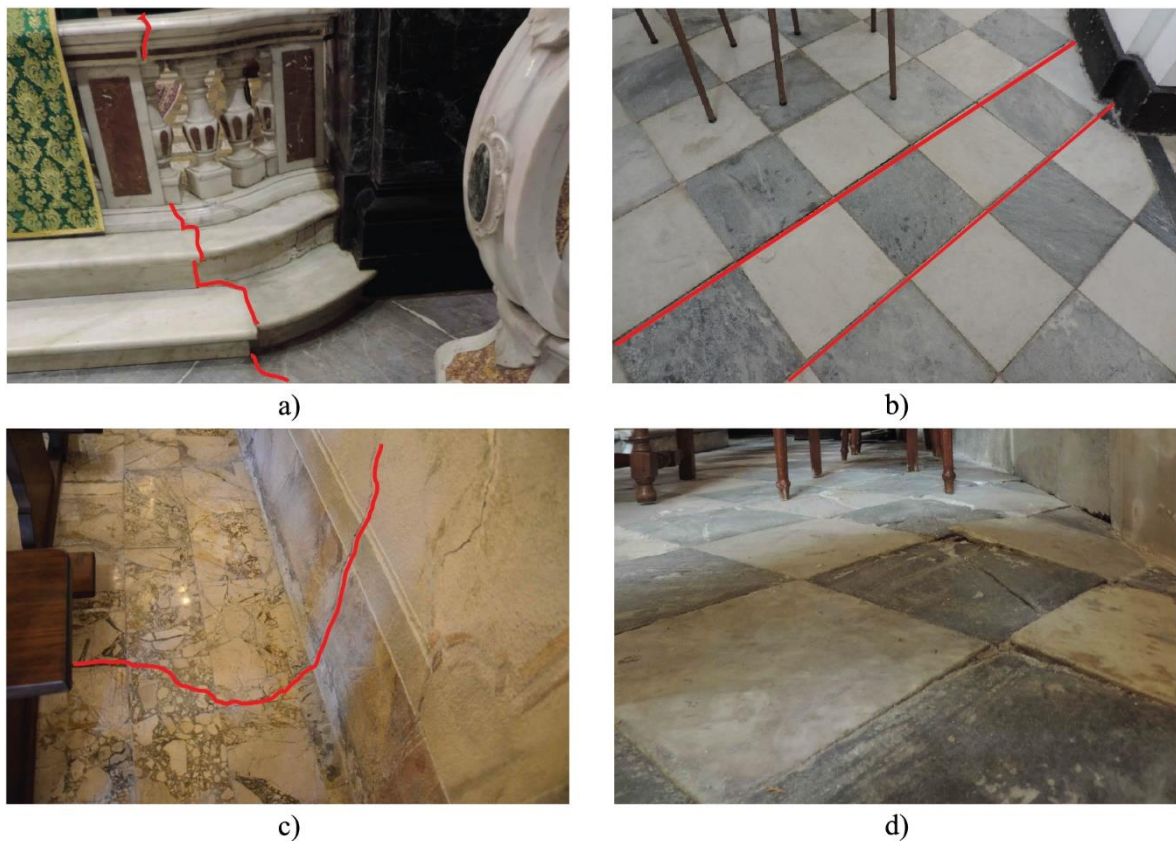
Damage of floors: a) cracks on step treads and balustrades bases (CH_17), b) parallel gaps among tiles (CH_29), c) cracks propagating from floor to wall (CH_28), d) sinking of floors (CH_15).
